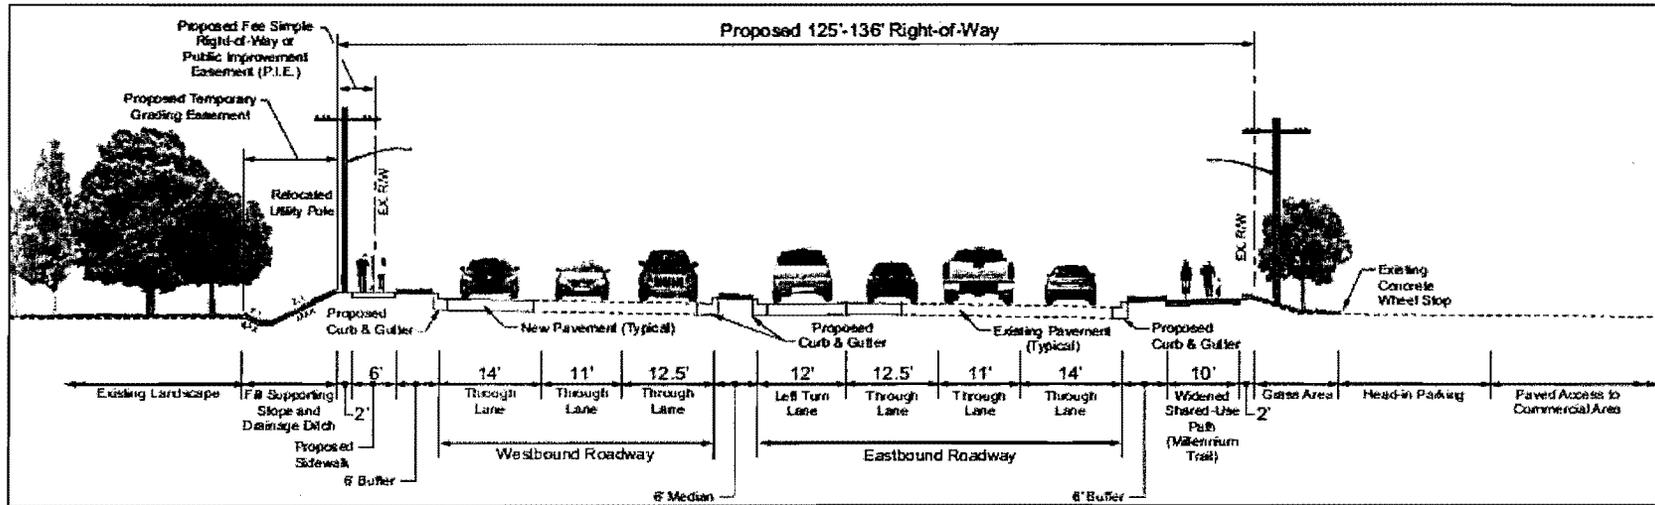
Alternative 3: Enhanced Master Plan, Recommended Alternative. Proposed typical roadway along East Gude Drive at Section A-A, approximately 1,000' east of Calhoun Drive.
